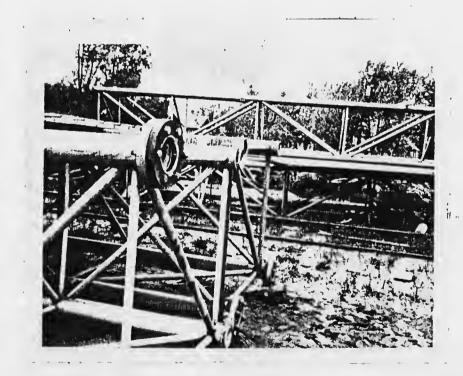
Mating ends of Sections B and C (Exhibit 2) showing failure of junctions between chord member and flanges.
